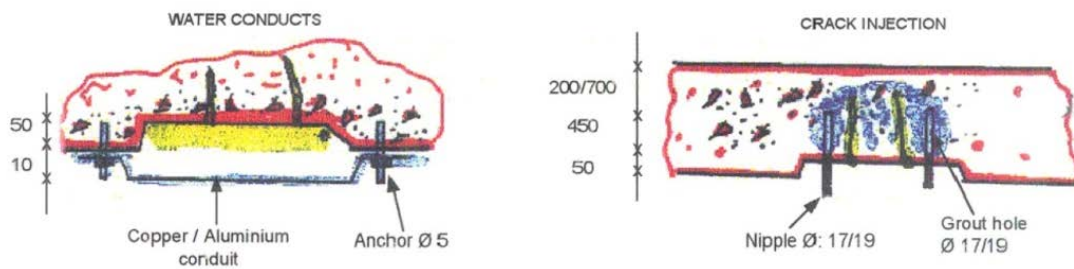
Copper or aluminum conduit along with crack injection used to convey water penetrating a concrete liner (Russell, 2001)
